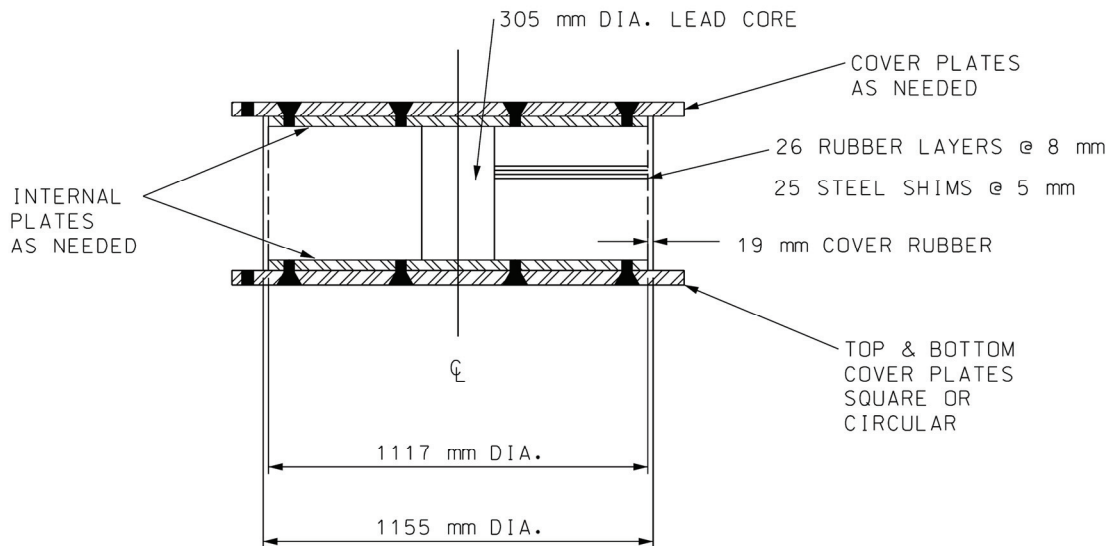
Large Scale Lead Rubber Bearing 2
